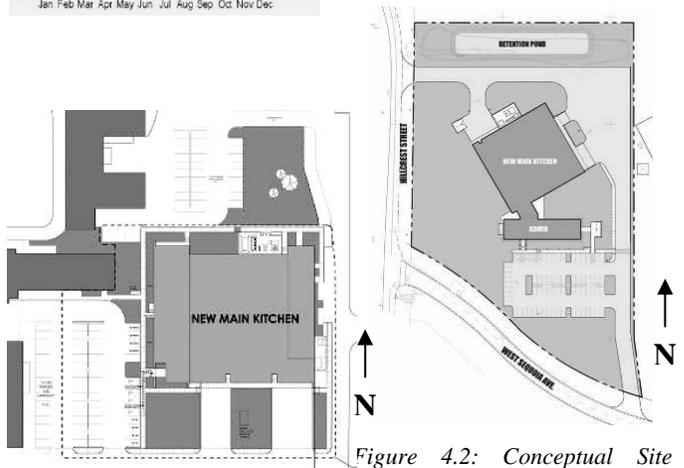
Conceptual Site Plans for Porterville (Left) and Napa (Right)
